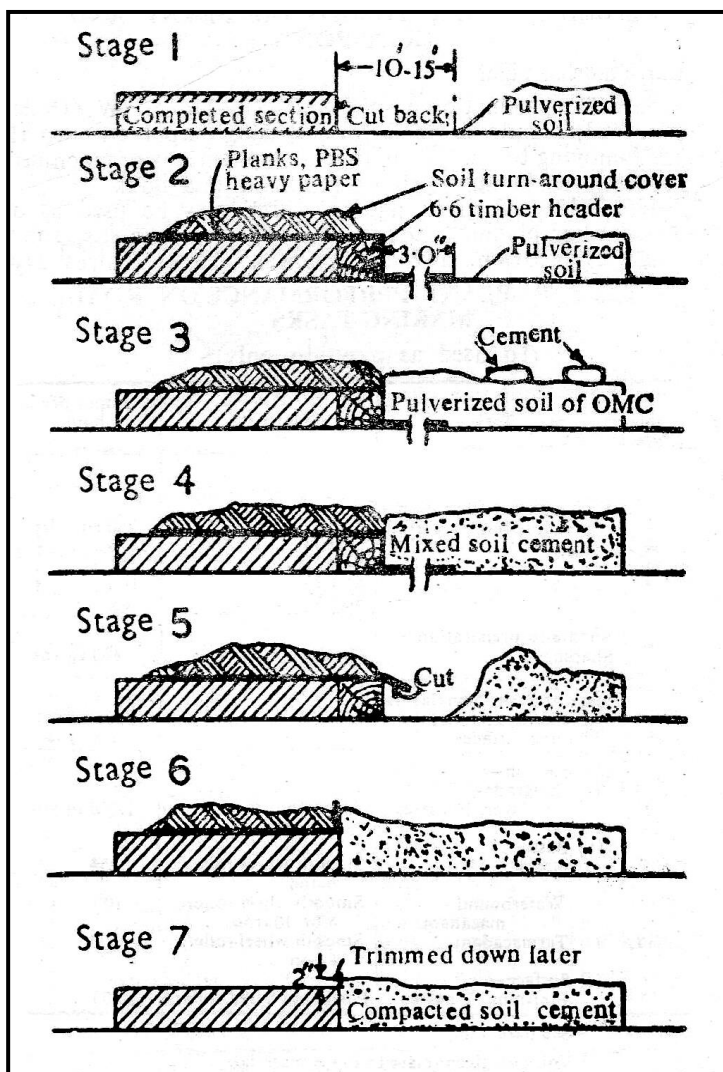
Stages in Formation of Construction Joints in Soil Cement
